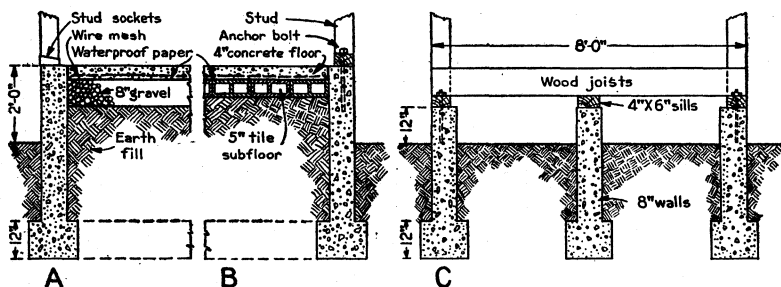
Suggestions for foundations and floors. A, Foundation and concrete floor on 8 inches of gravel or broken-stone fill; stud sockets or anchors used; depth of foundation varies with ground conditions. B, Concrete floor on building tile for dryness; wood sills bolted to foundation. C, Foundation of three continuous concrete walls for high crib with wooden floor
